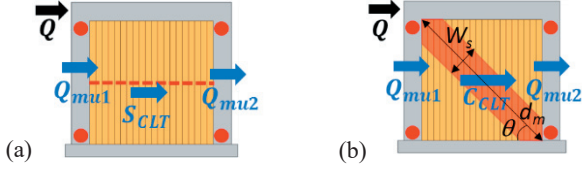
(a) CLT shear failure for RC frame with CLT infill; (b) CLT compression failure for RC frame with CLT infill.
